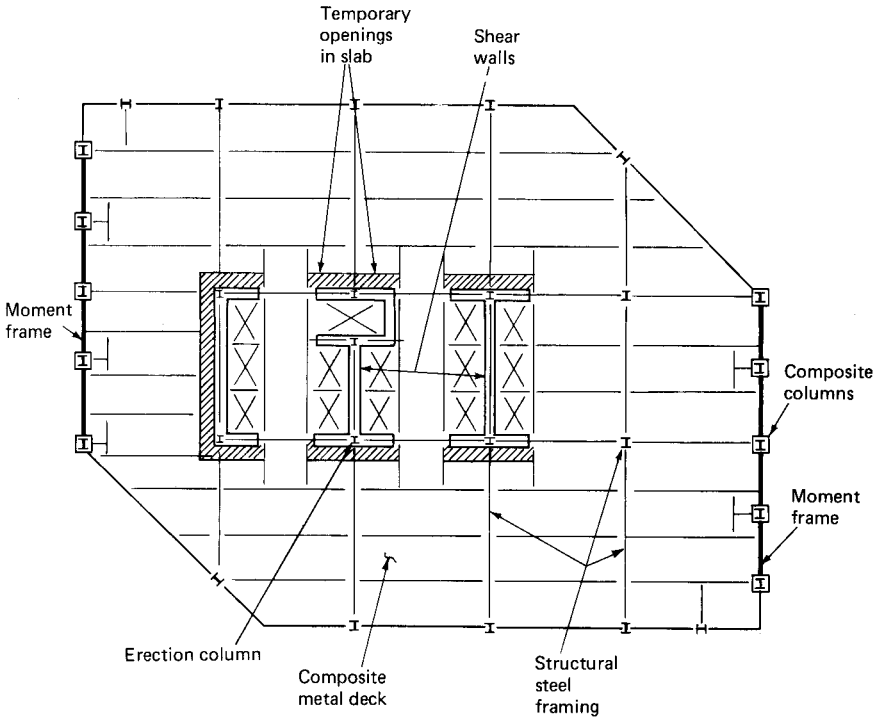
Typical floor plan of composite building using shear wall-frame interaction.
